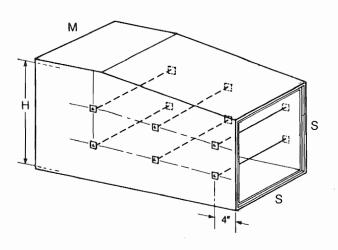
TRANSITION REINFORCEMENT CHEEK PANELS
